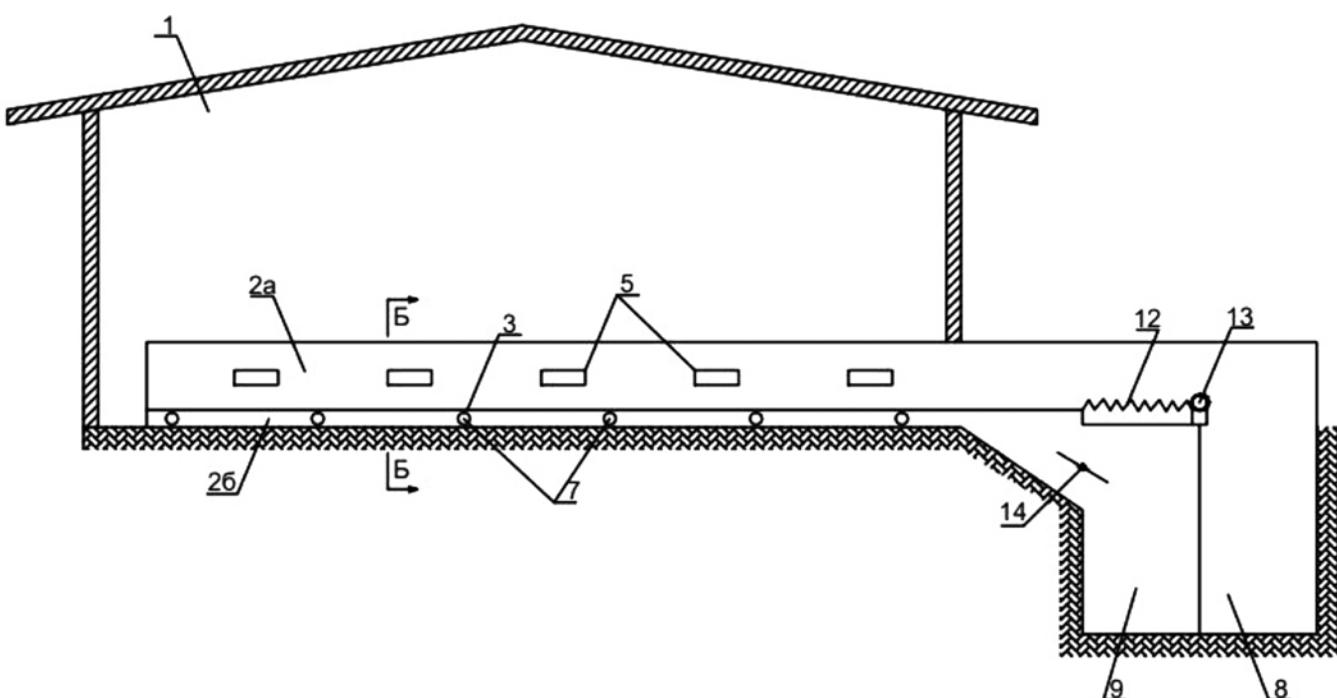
Schematic layout of the ventilation system equipment in the workshop plan
